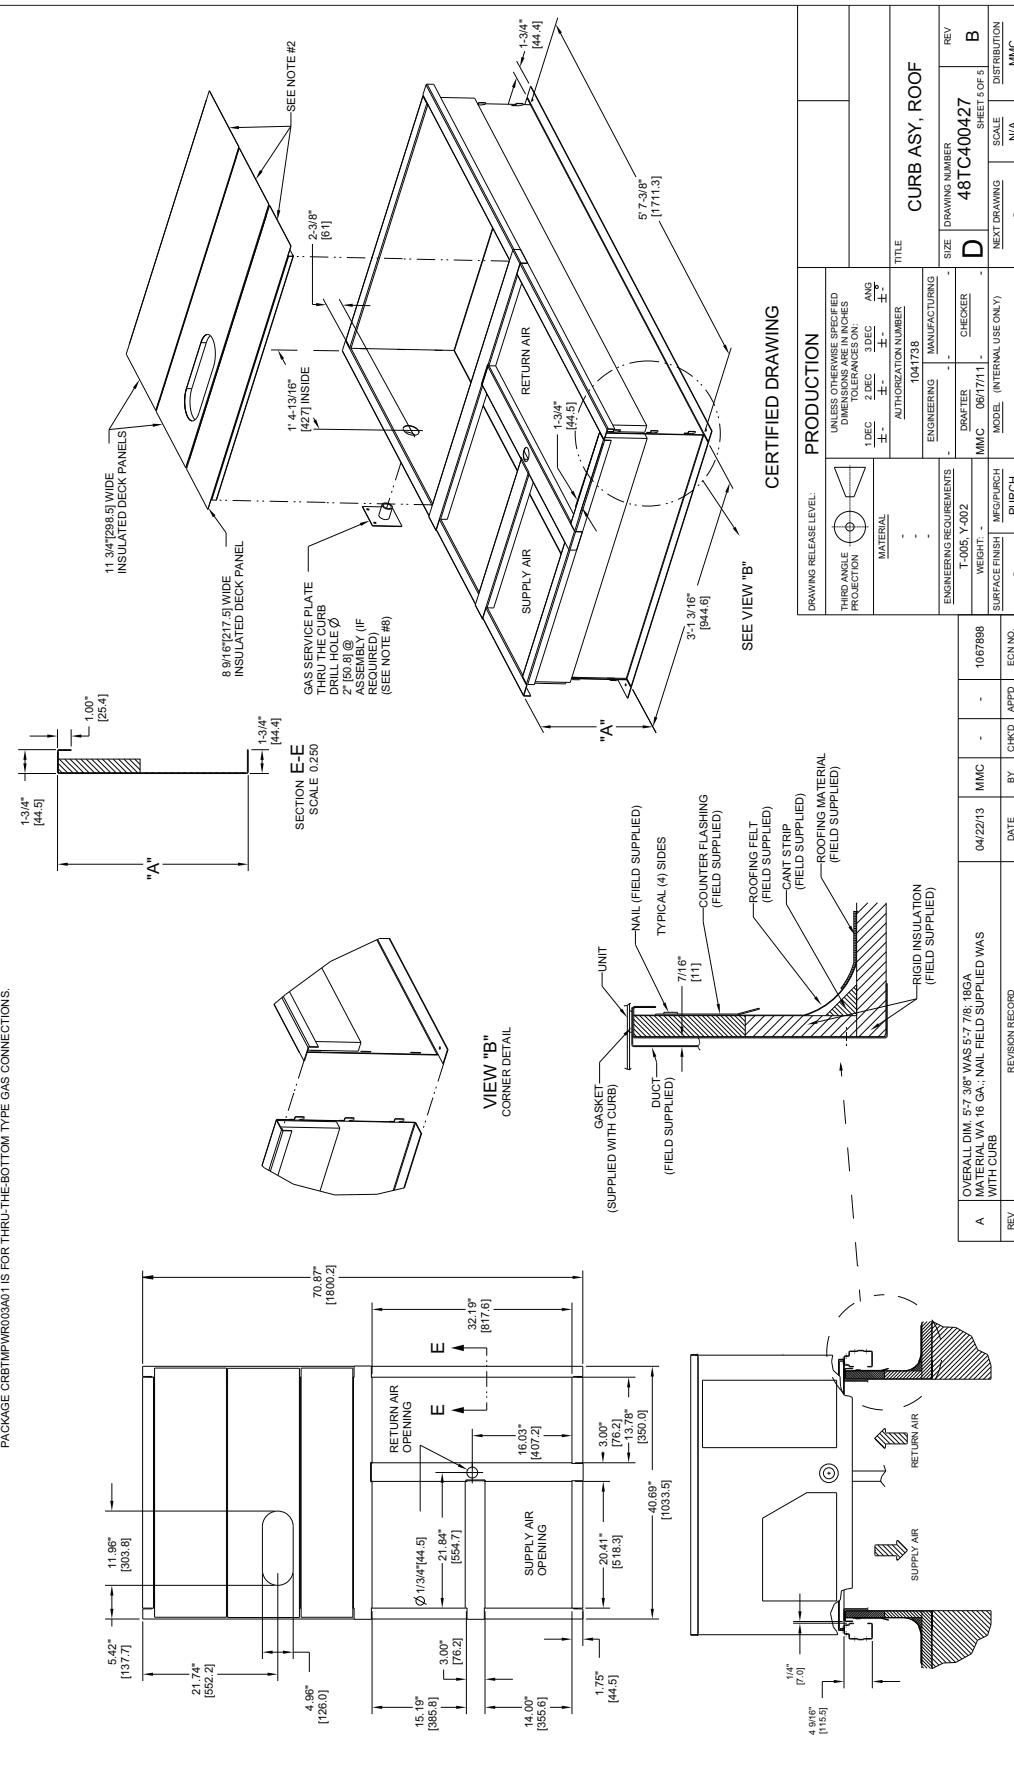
50FCQ 04-07 Roof Curb Dimensions
